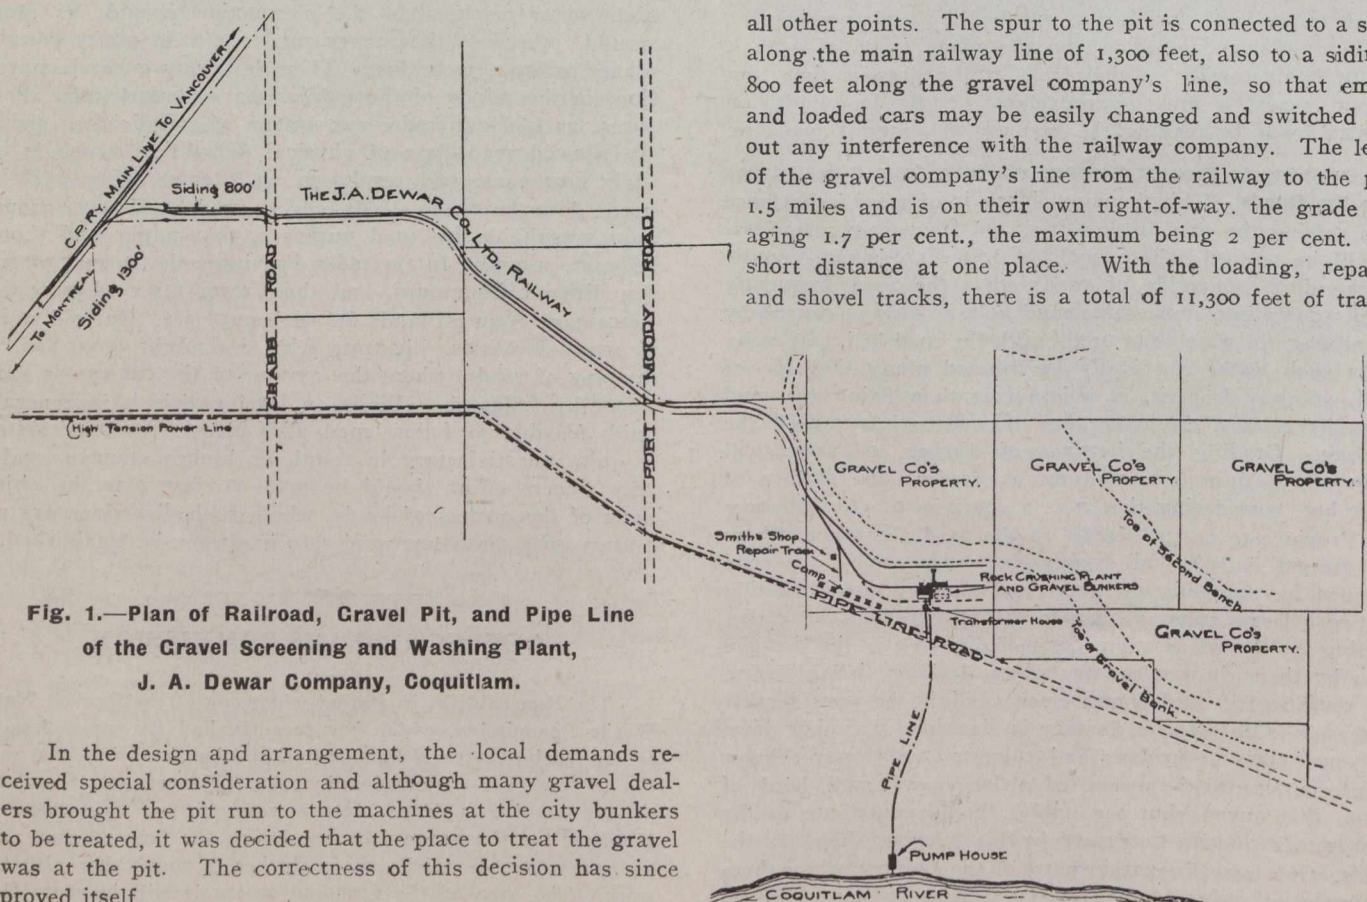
Plan of Railroad, Gravel Pit, and Pipe Line of the Gravel Screening and Washing Plant, J. A. Dewar Company, Coquitlam.
